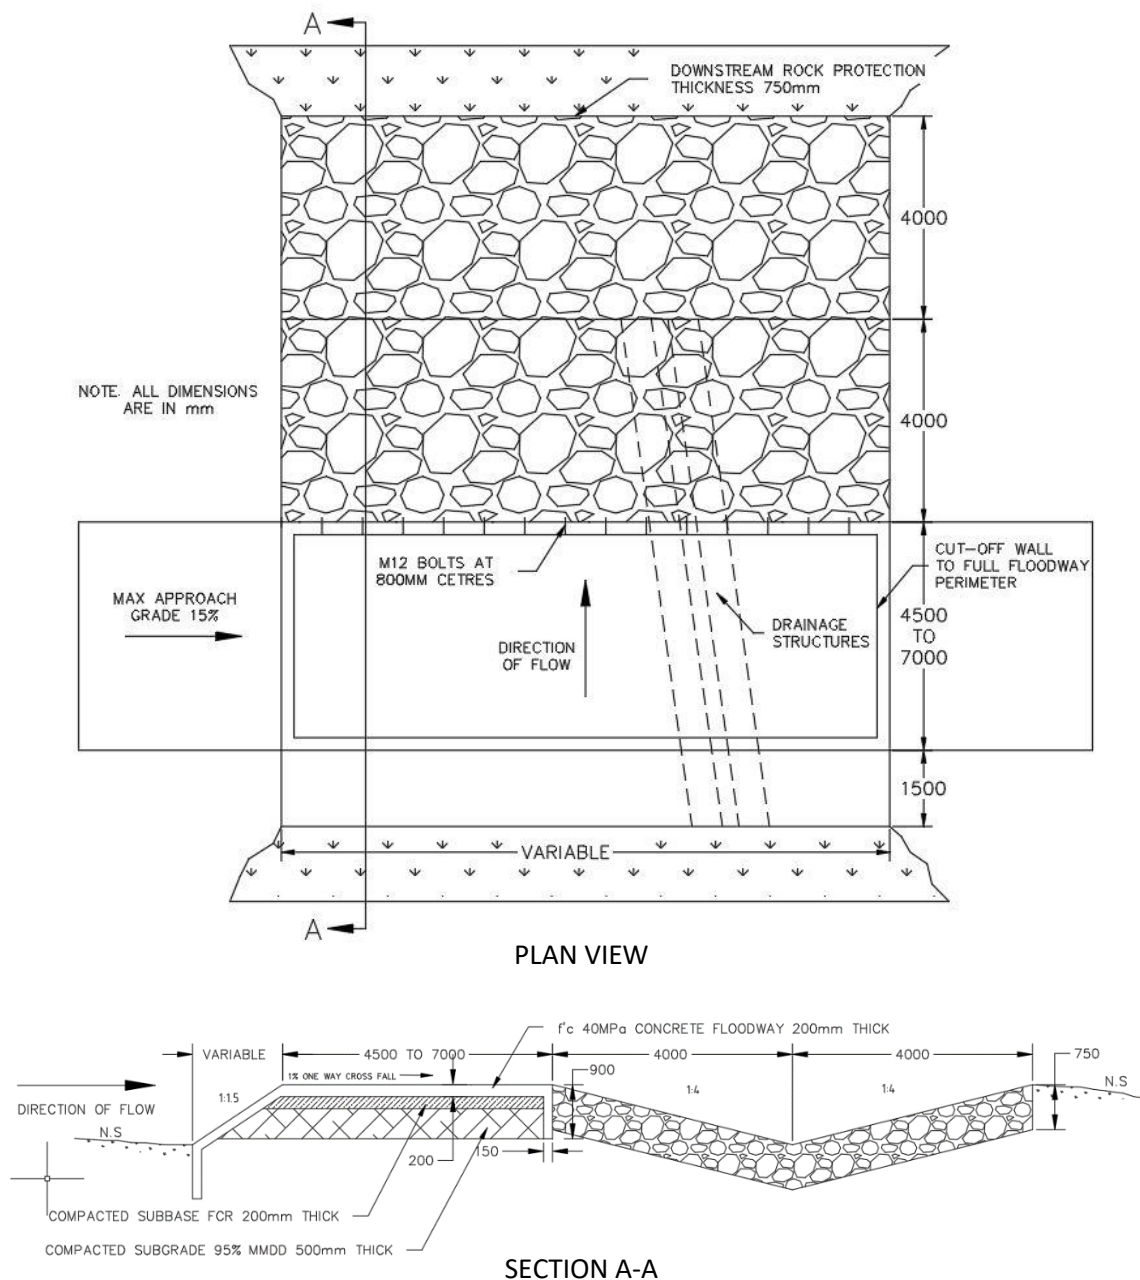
Floodway Type 5 details (LVRC 2008e).
